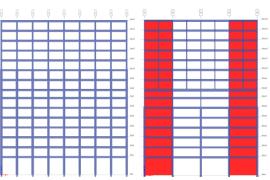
Elevation of Building Model-5 along y-dir. Fig 16: Elevation of Building Model-5 along x-dir.
